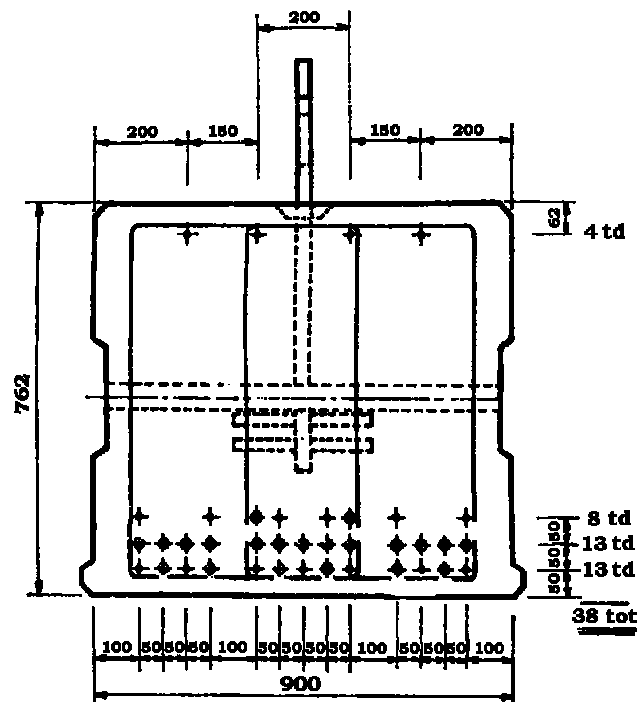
Typical cross section of the reference bridge beams at mid-span (in mm)
